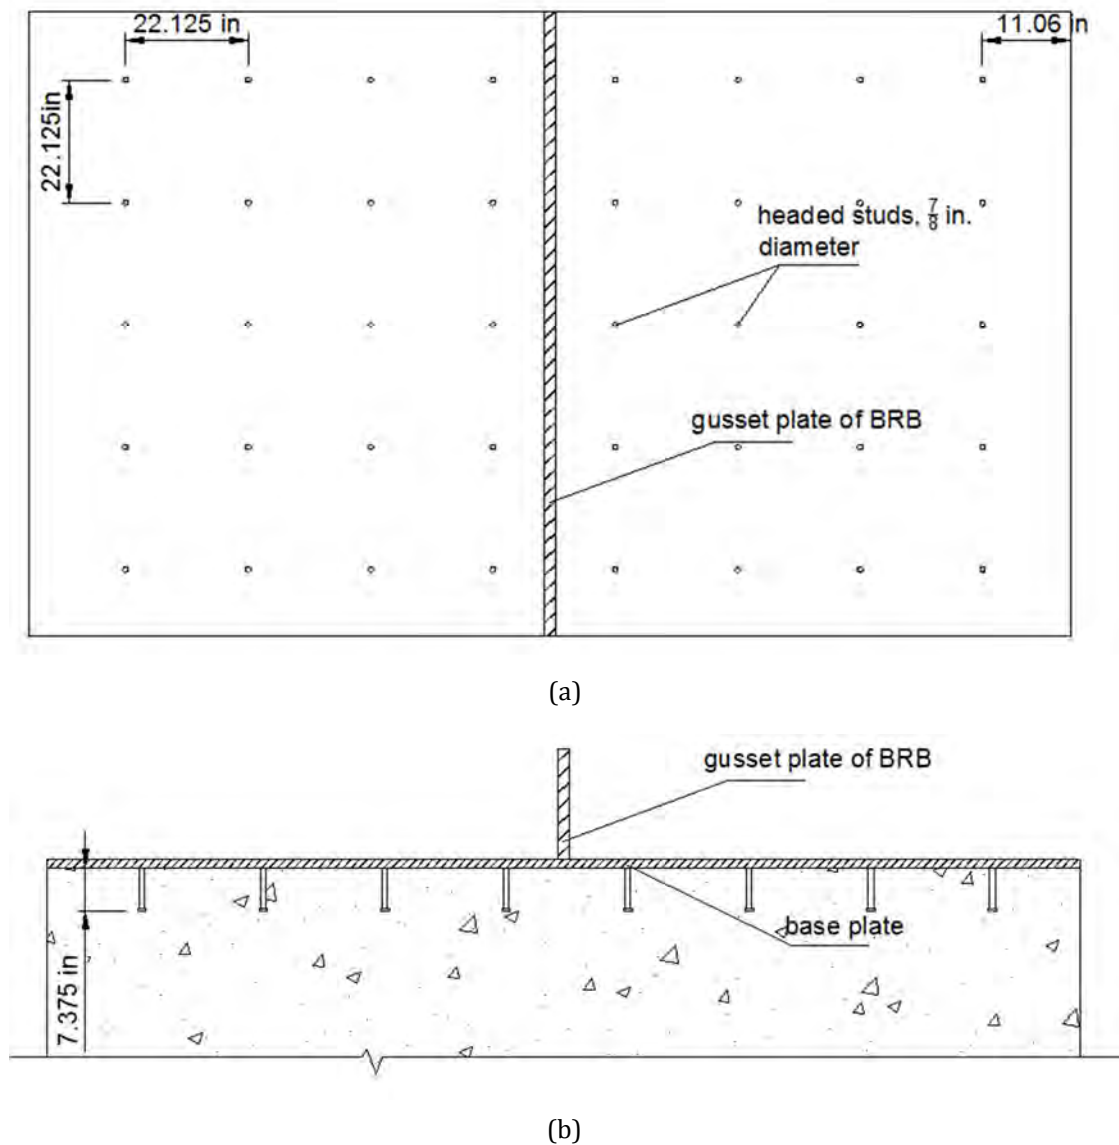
(a) Top view of BRB gusset plate connected with foundation (b) Side view
